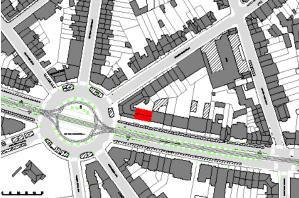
Etrimo apartment building located Avenue Winston Churchill 120, Uccle. Implantation
